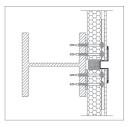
Ob-24 flashing "Masking strip, sunken"
